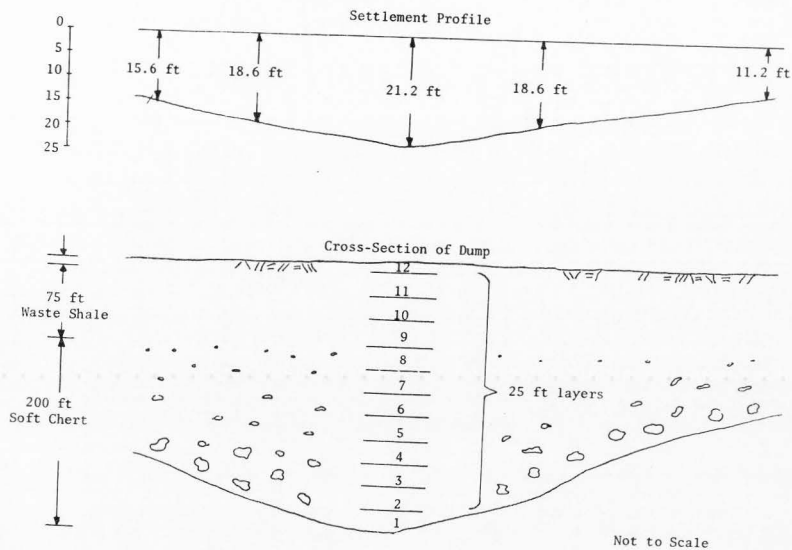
Typical cross-section used as example problem also showing predicted settlement profile (1ft = 0.305 m).
